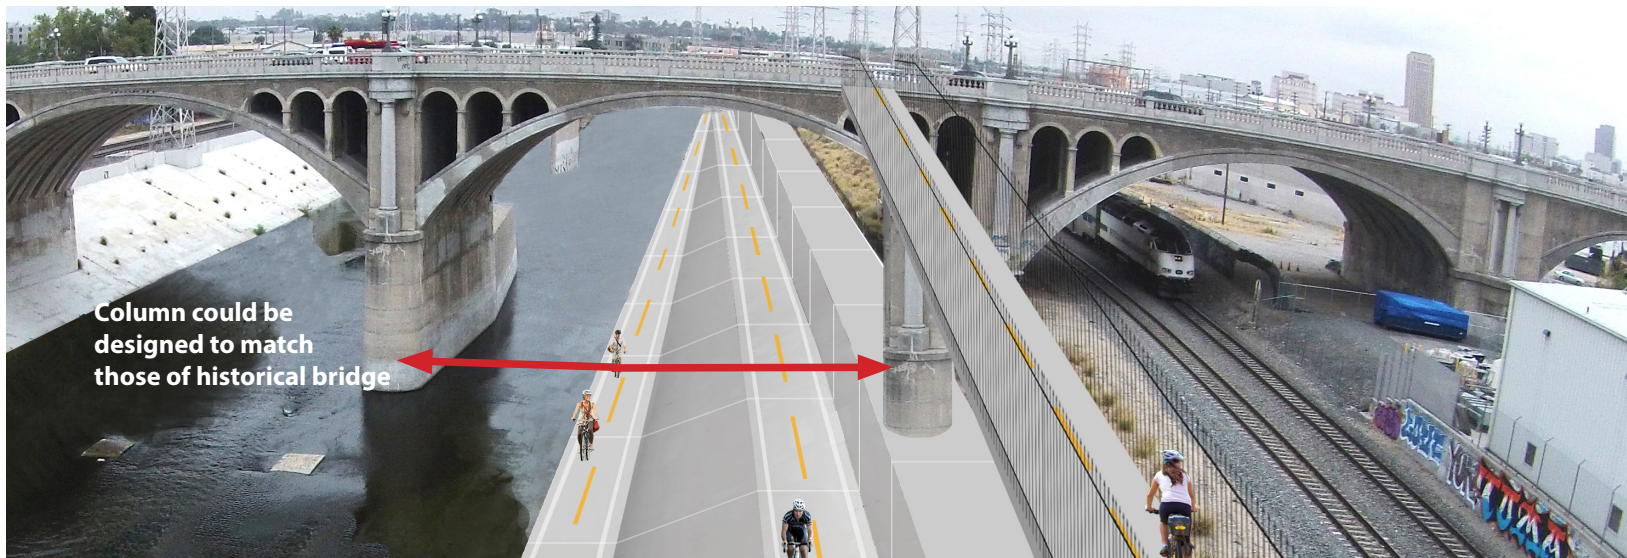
Access Bridge Structure: Conceptual Rendering
